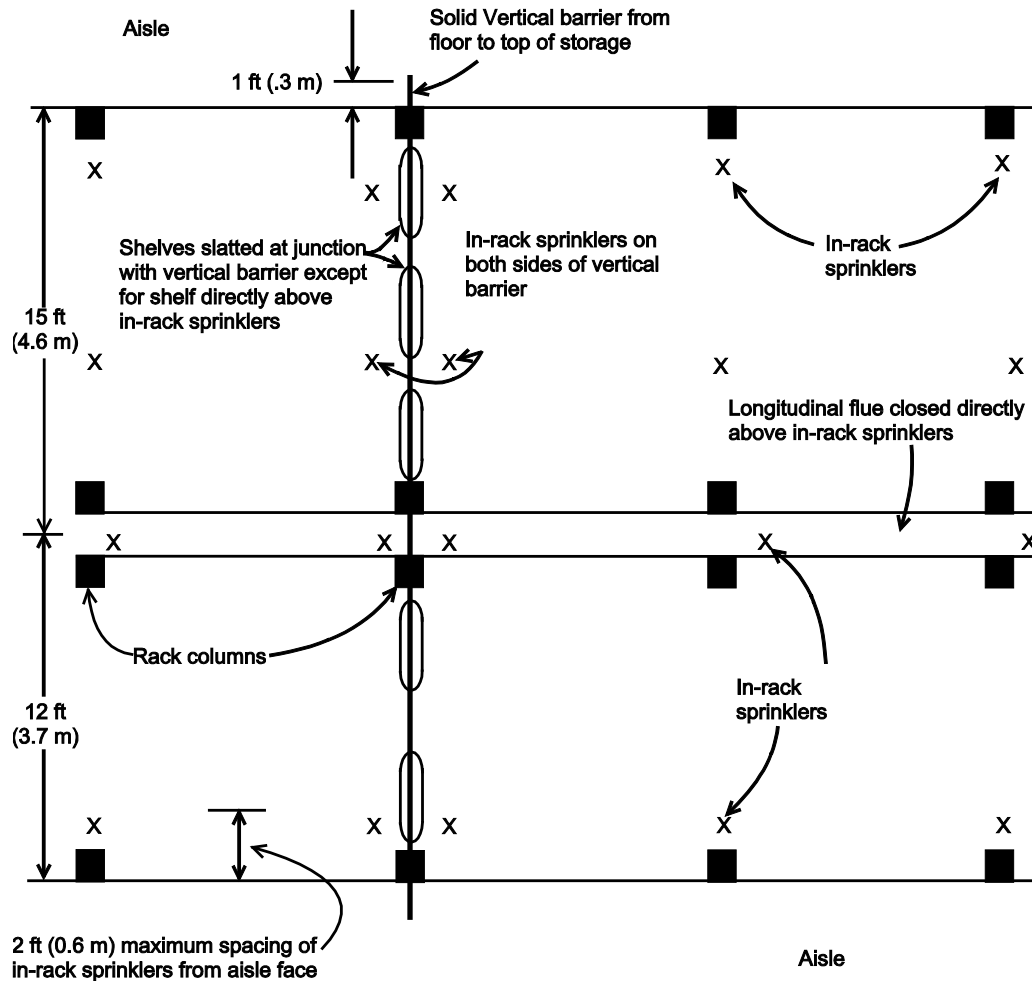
Plan View Showing Typical In-Rack Sprinkler, Barrier And Shelf Arrangement For 12 ft And 15 ft (3.7 m And 4.6 m) Back-To-Back Carpet Racks.
